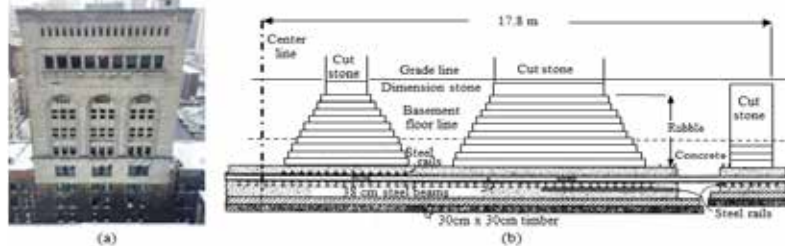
(a) Auditorium Building Tower (Author) and (b) Tower Foundation
